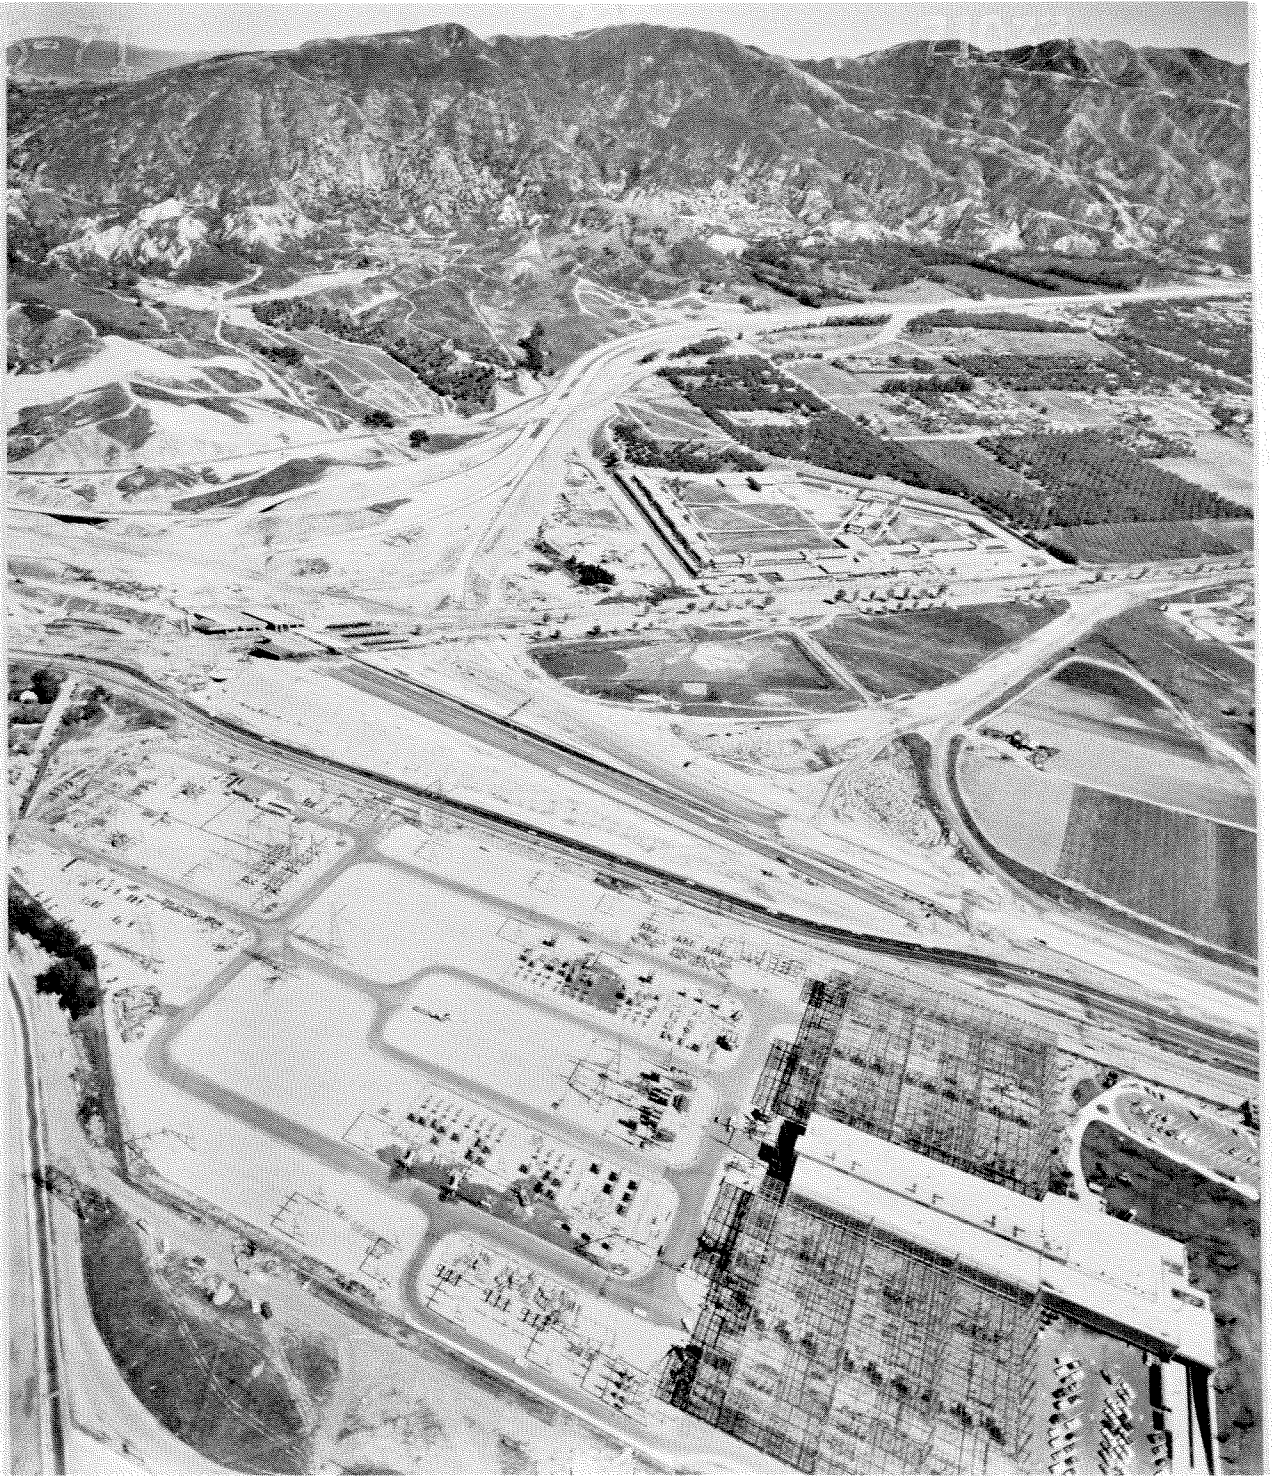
Looking northeast over the Pacific Intertie Converter Station in the foreground. The Golden State Freeway, under construction, is just beyond the Converter Station. The Southern Pacific Railroad tracks intersect the freeway and pass just in front of the San Fernando Juvenile Facility which is the pentagonal arrangement of buildings. In the background is Foothill Freeway, under construction.
